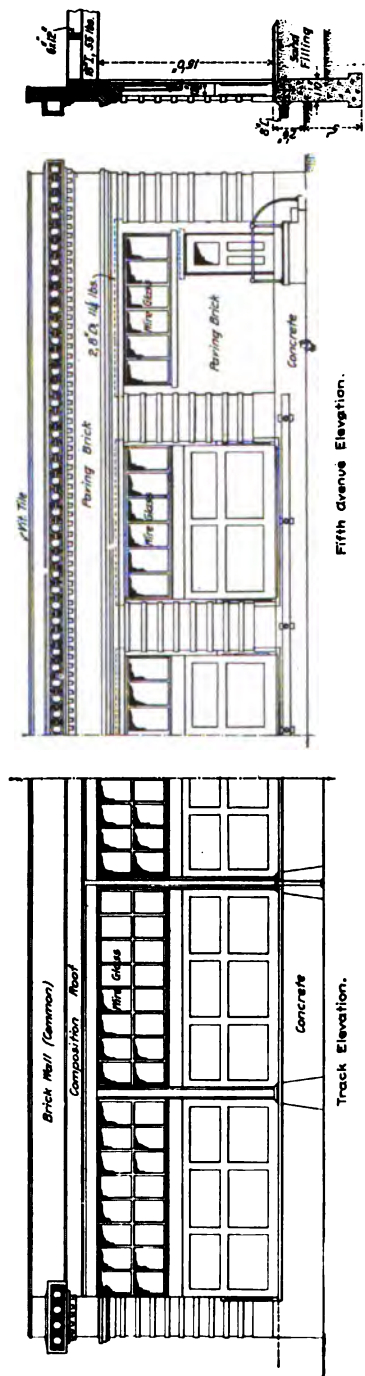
Part elevations and section through side walls of freight-house, Chicago—Baltimore & Ohio.
